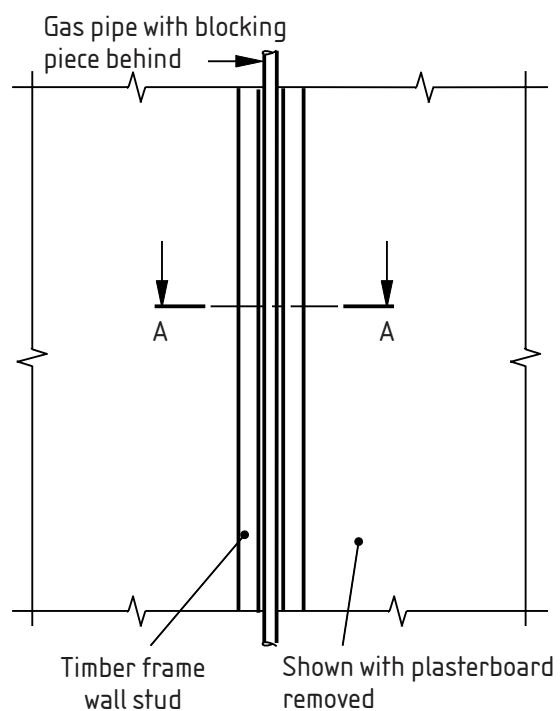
Typical examples of pipes in masonry and timber frame walls (continued)
